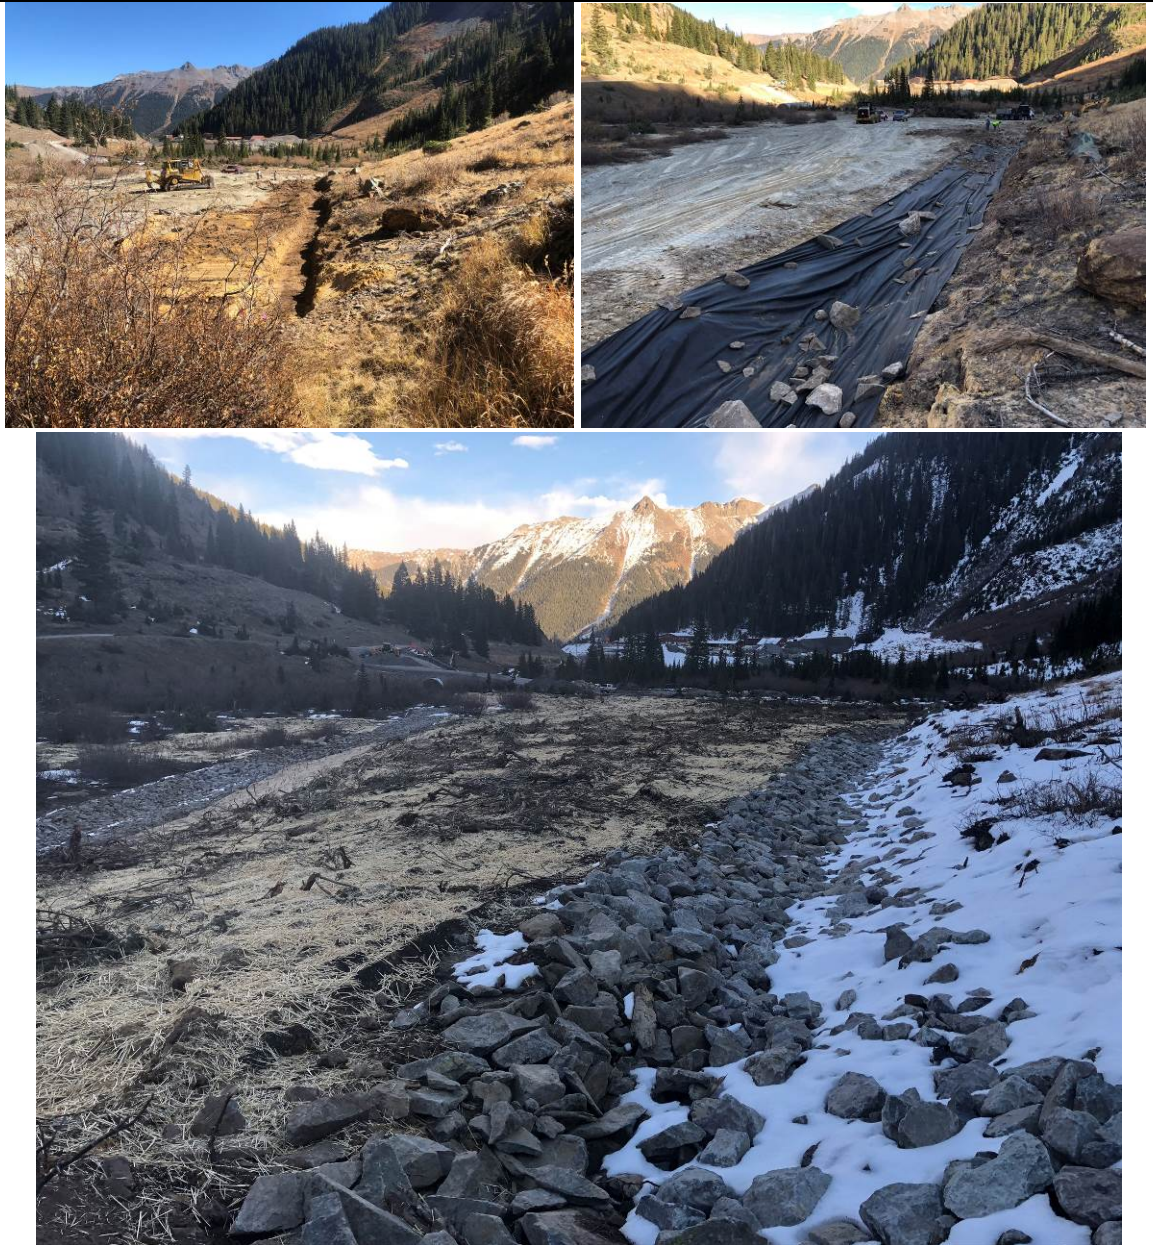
Upper left photo showing start of construction on grey tailings area and beginning layout of run-on channel. Upper right photo depicts during conditions of run-on channel with geotextile liner laid out along channel profile. After conditions of rock-lined run-on and run-off channels both in view in bottom-center photo.
